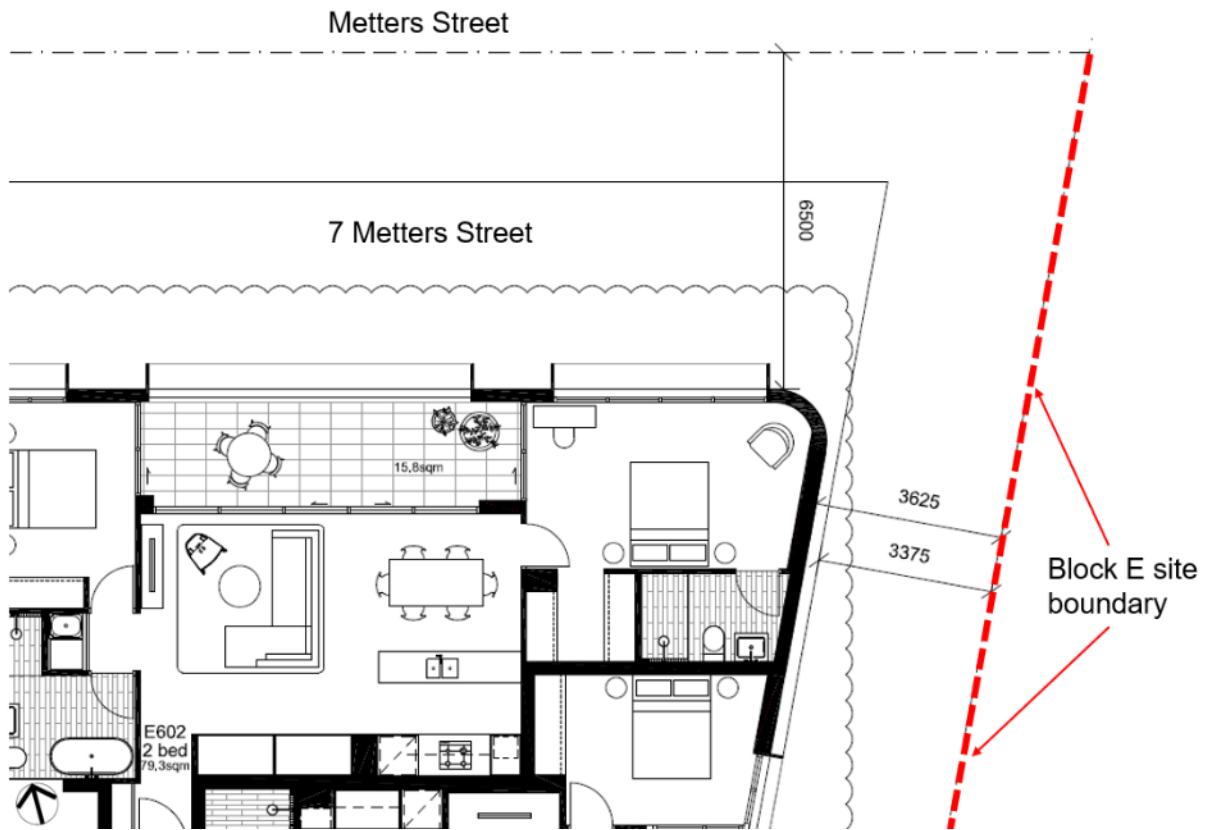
Approved floor plan - Level 6 of 7 Metters Street (D/2014/1703/A), depicting separation to side boundary with Block E
